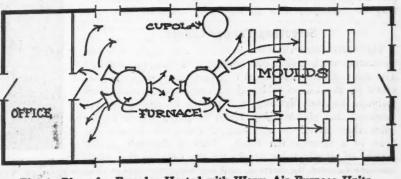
Plan of a Foundry Heated with Warm Air Furnace Units.
